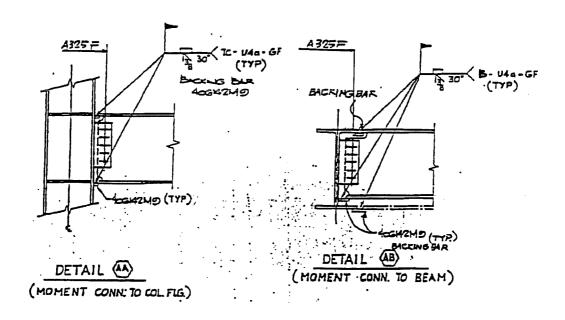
Moment Connection Details From Contractor's Shop Drawings
